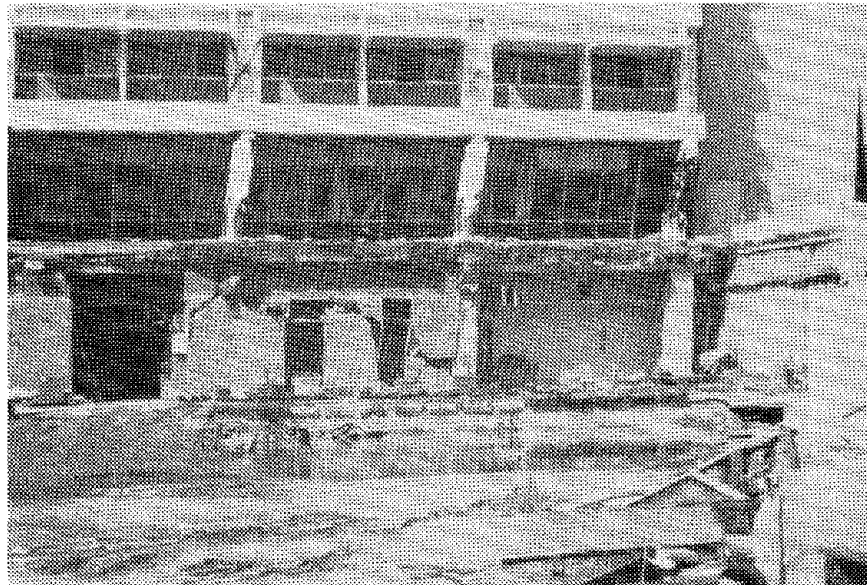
DETAIL OF DAMAGE TO WING C AFTER REMOVAL OF COLLAPSED TERRACE CANOPY SHOWING DISTRIBUTION OF DAMAGE TO LOWER THREE STORIES. NOTE DAMAGE TO NONSTRUCTURAL MASONRY PARTITIONS IN GROUND STORY
